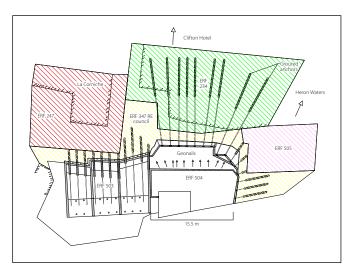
Plan view of anchor layout required for ERF 503 and 504
